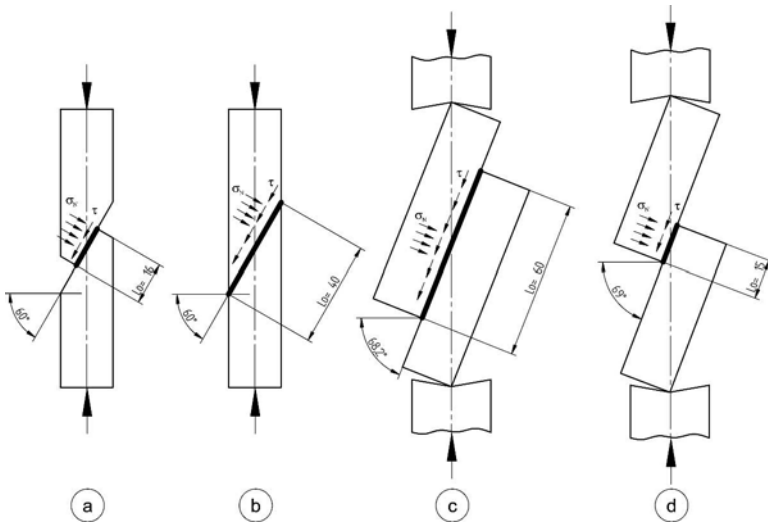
Specimen geometries of different slantwise orientated joints: Prismatic specimen (a) and (b) with inclination of 60° used by Refs. 16 and 18, variable single overlap shear specimen made of cubic prisms with large overlap (c) and small overlap (d).
